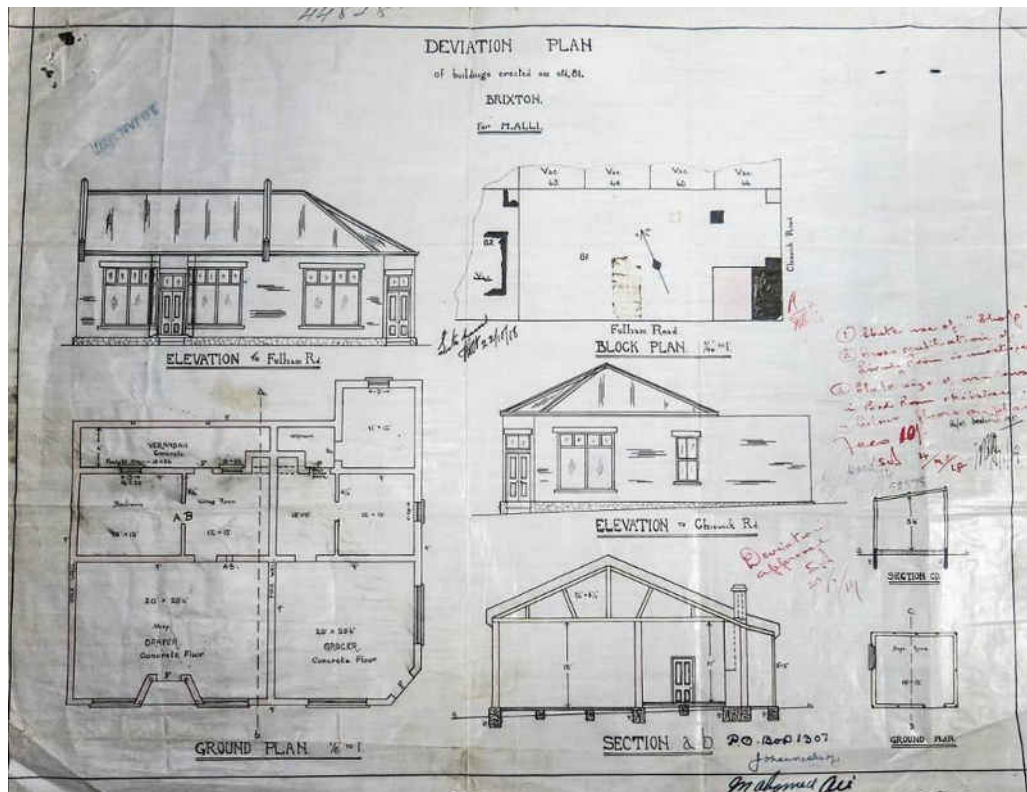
Proposed original plan for corner shop on Stand 81 from 1918
